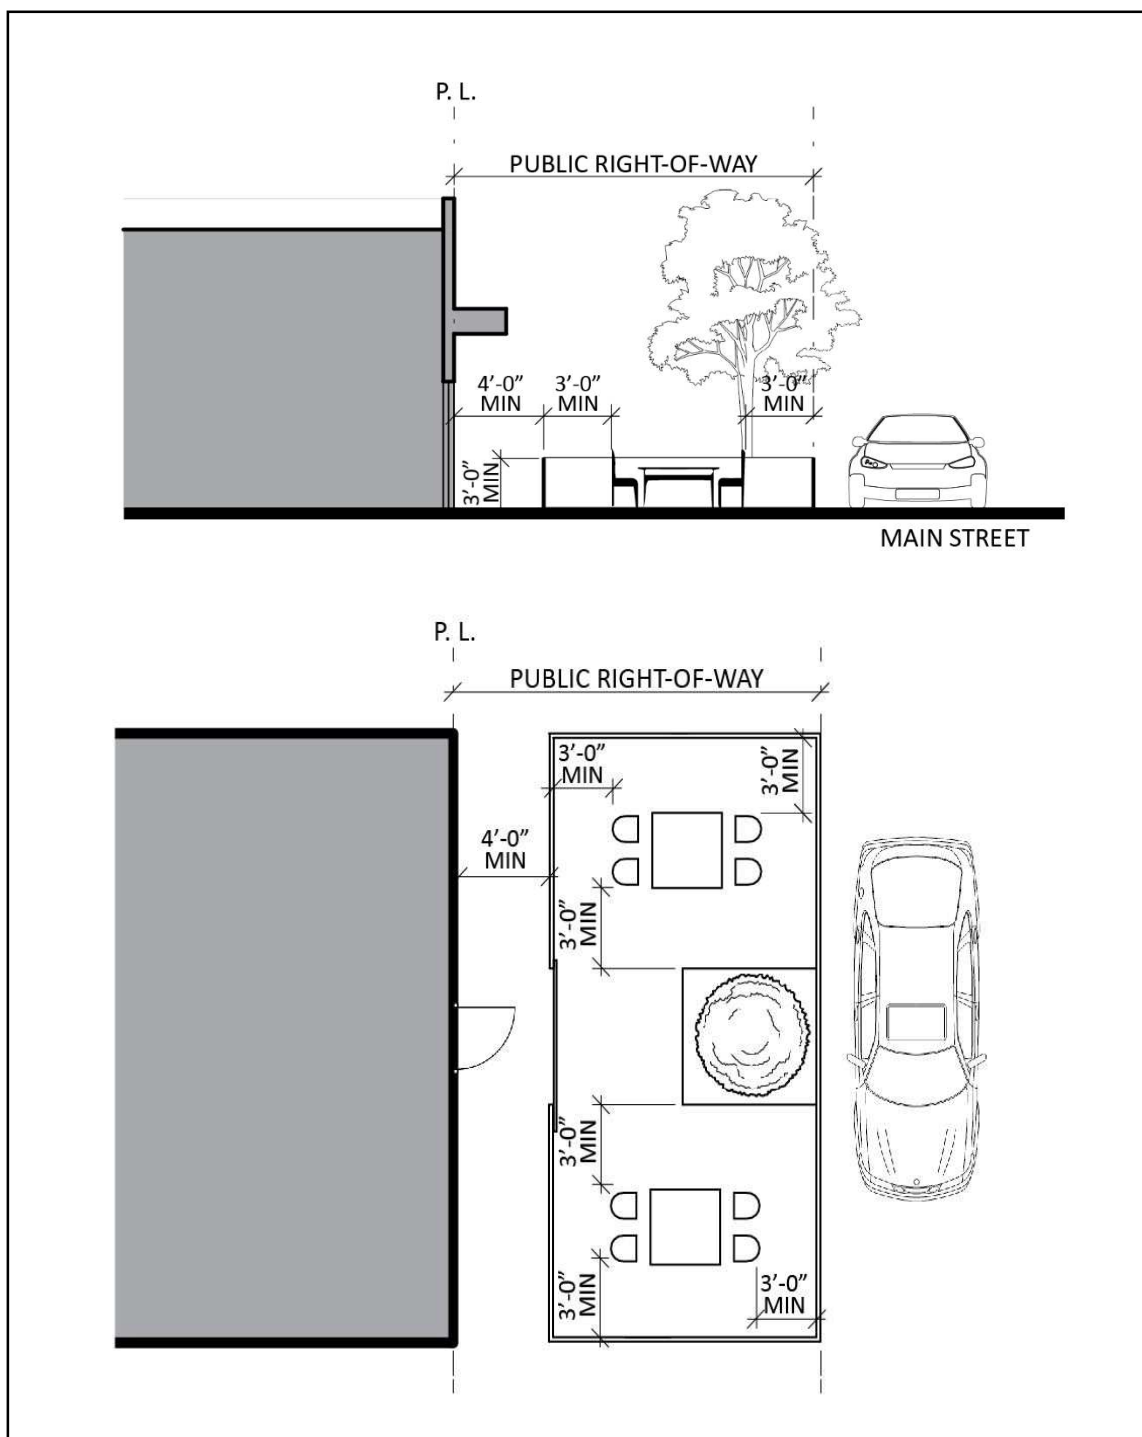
Example of an outdoor dining area in the public right-of-way with a barrier.
